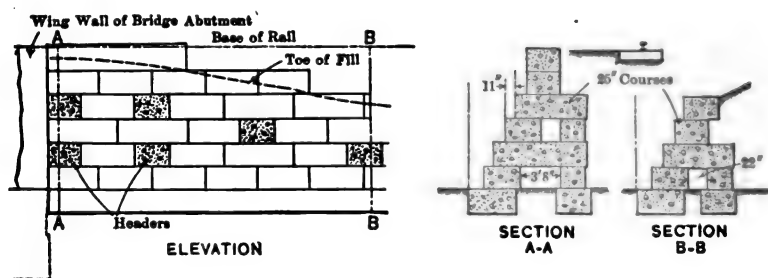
CONCRETE BLOCK RETAINING WALL, C. M. & ST. P. RY.
